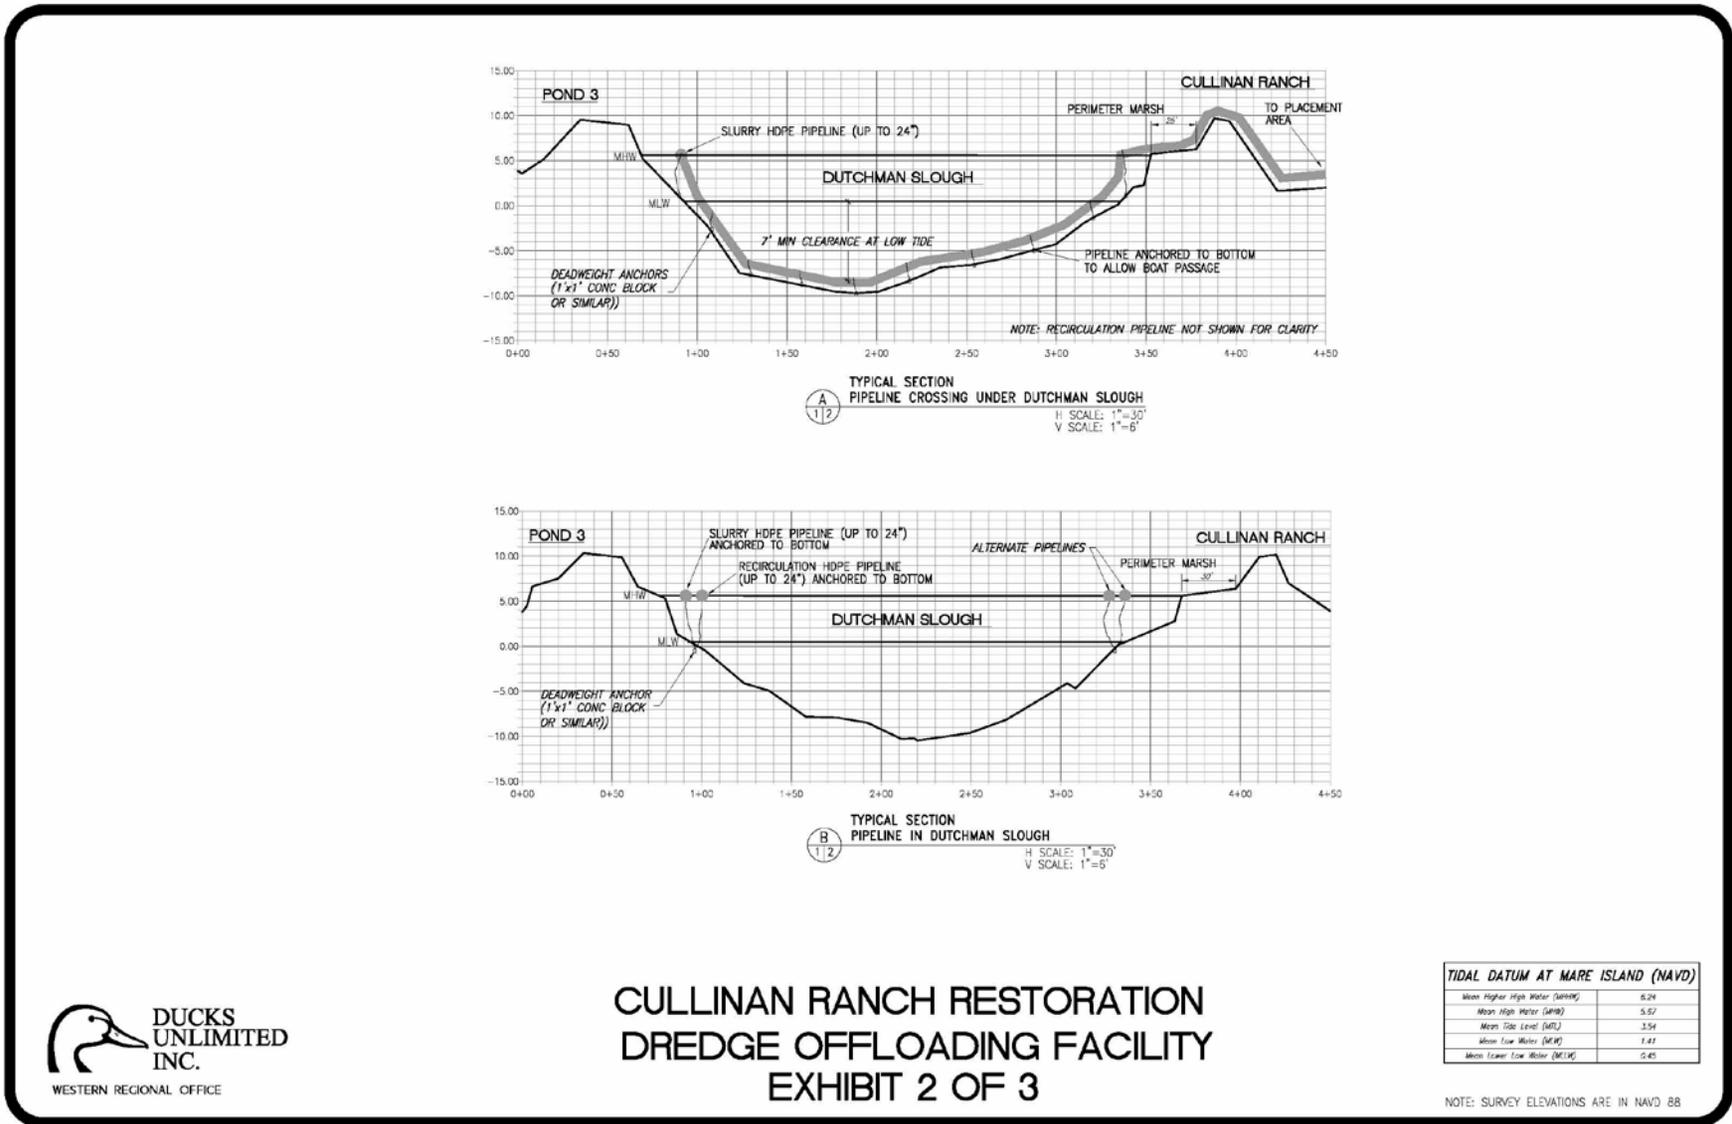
OLF Sediment Pipeline in Dutchman Slough, Typical Section
